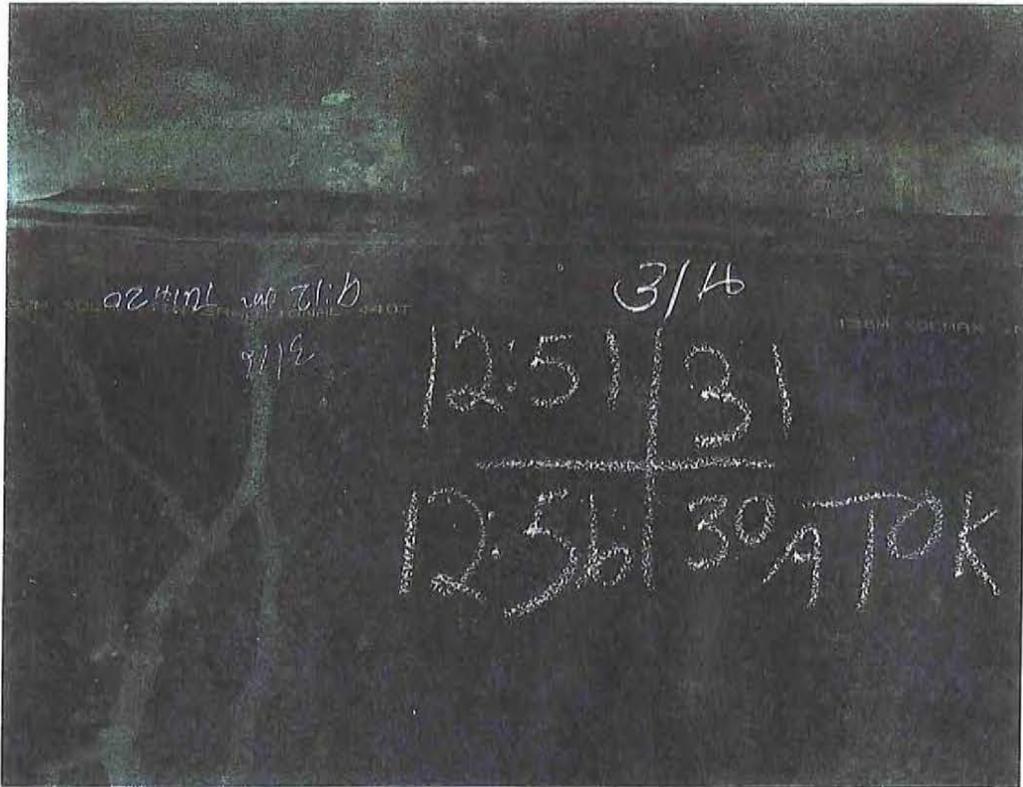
Non-destructive air-testing information on HDPE geomembrane.
